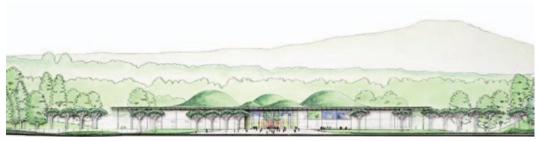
An artist's sketch of the new Academy building as seen from the the front. Image provided by Renzo Piano Building Workshop.
